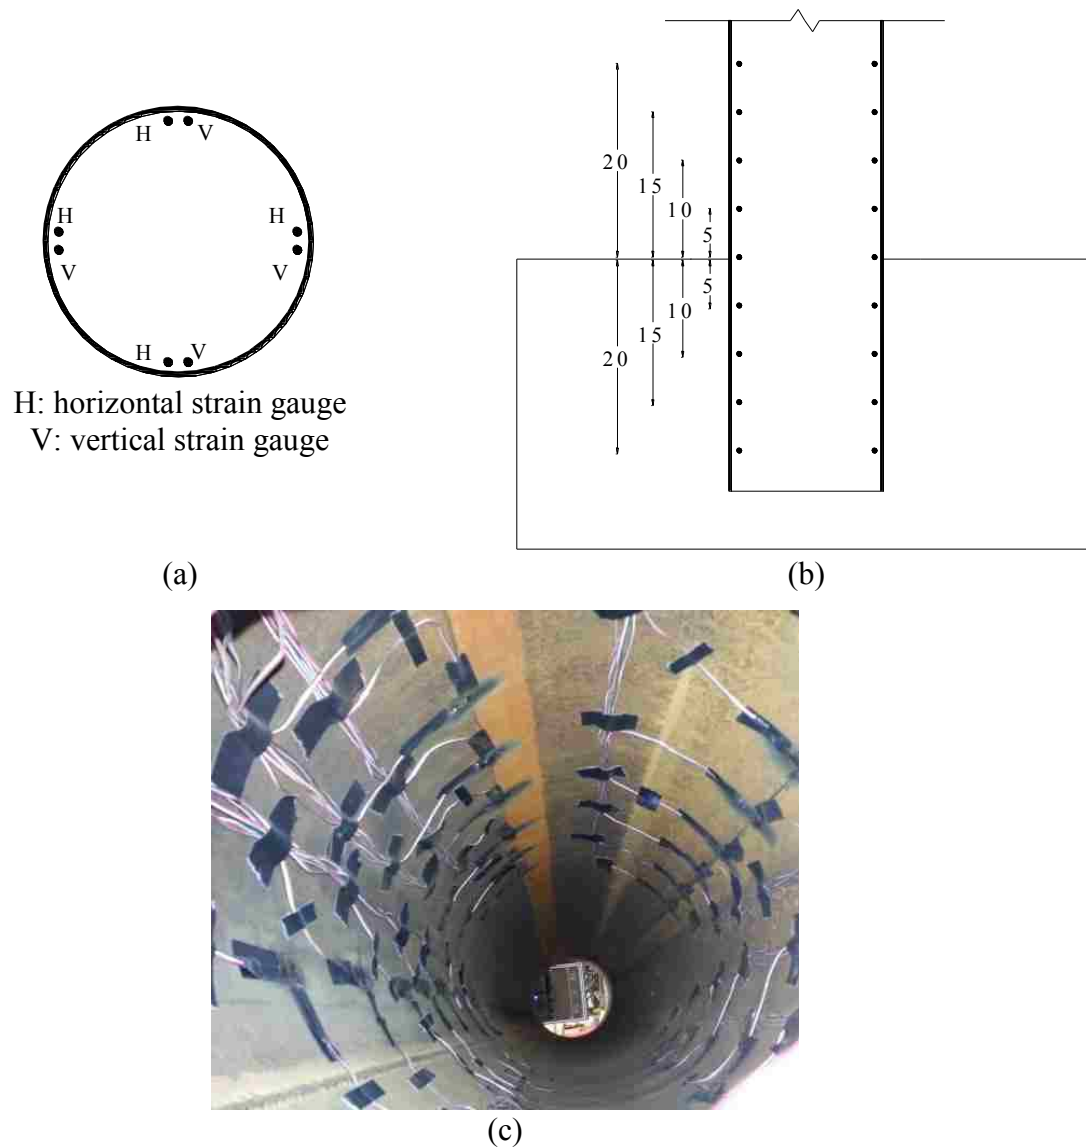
Install strain gauges inside steel tubes: (a) arrangement in cross-section, (b) arrangement along the height, and (c) inserting strain gauges into steel tube
